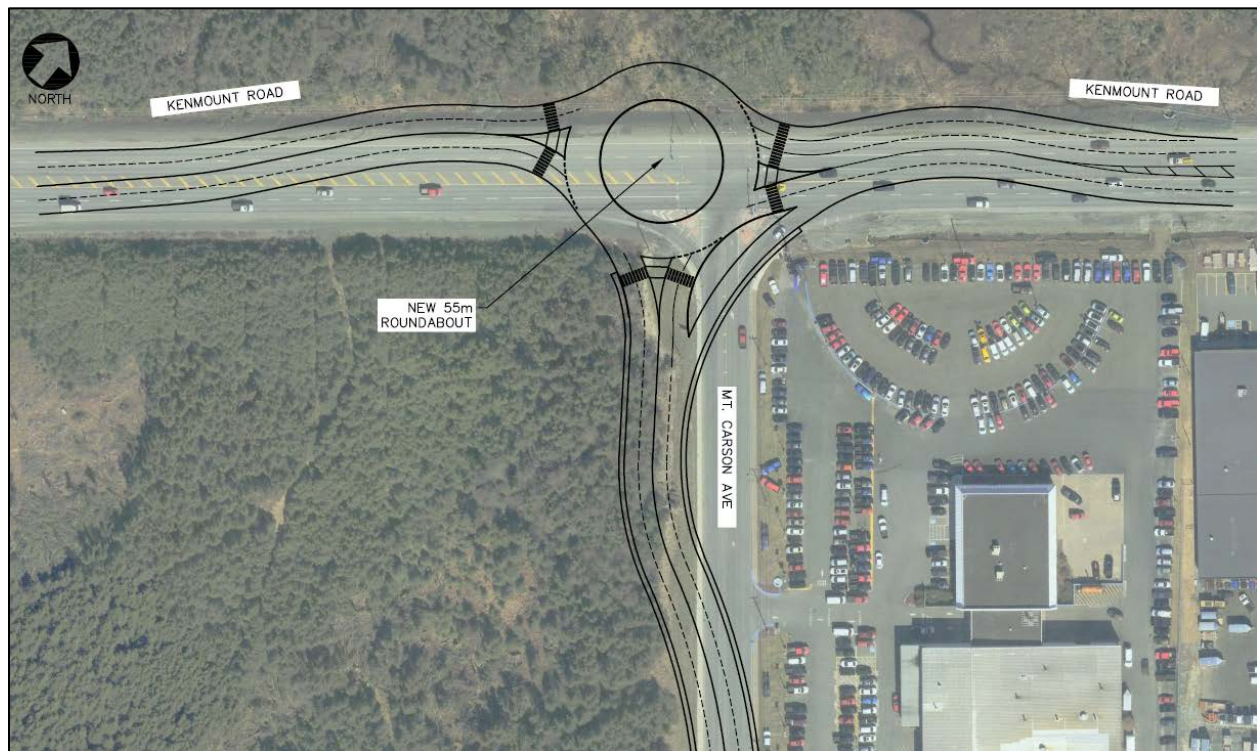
Roundabout at Kenmount Road & Mount Carson Avenue
